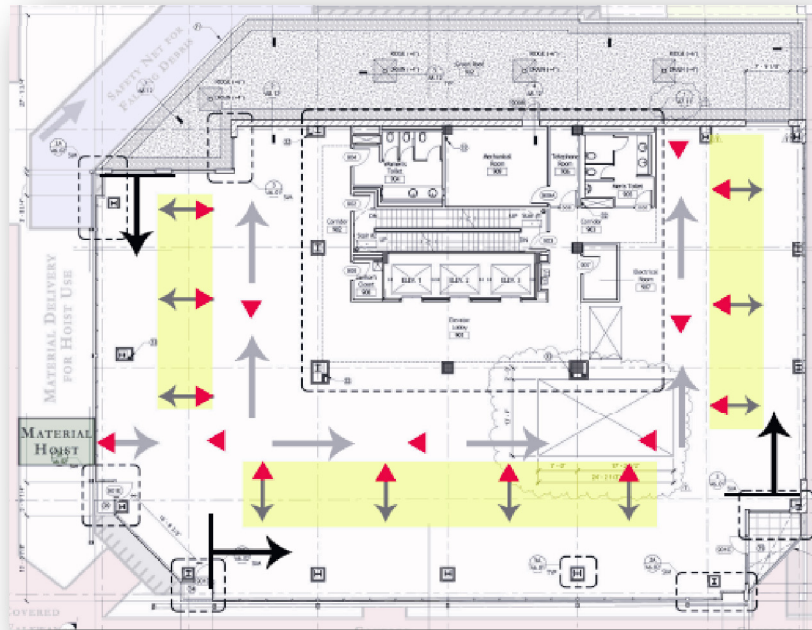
Workflow Plan (9<sup>th</sup> Floor – Roof)
